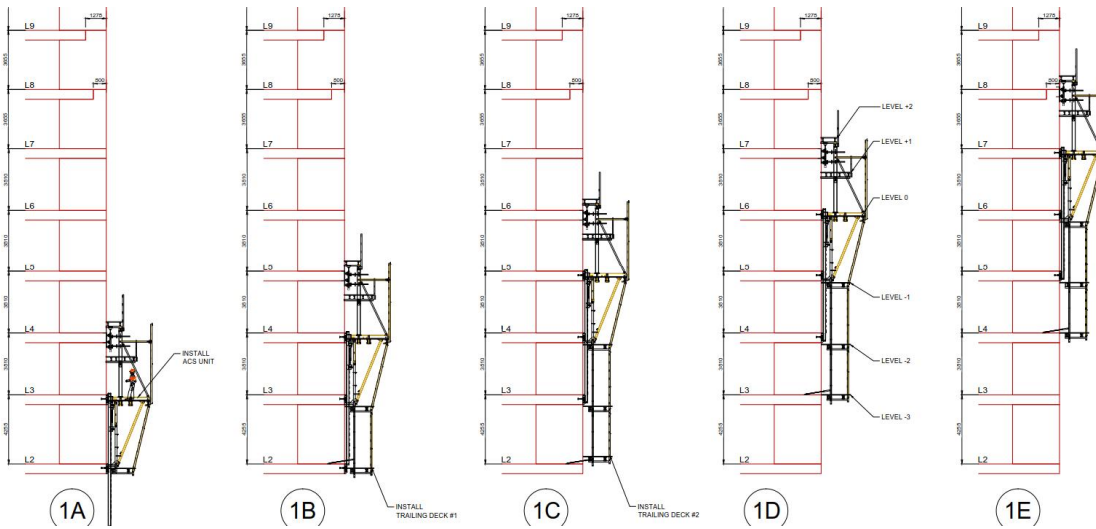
Proposed Wall Climbing System Western Elevation RC elements outside Steel Lift Core
